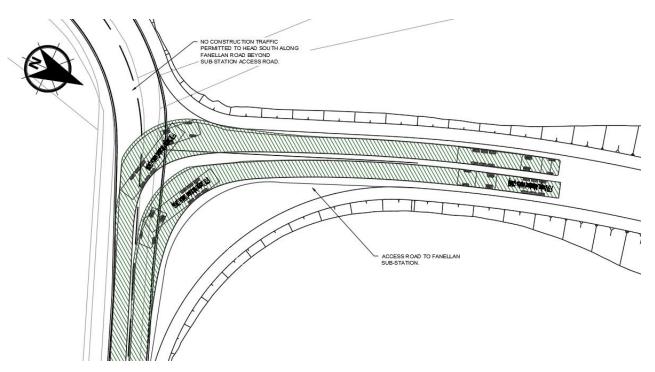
HGVs entering / existing C1106 / sub-station access road junction
